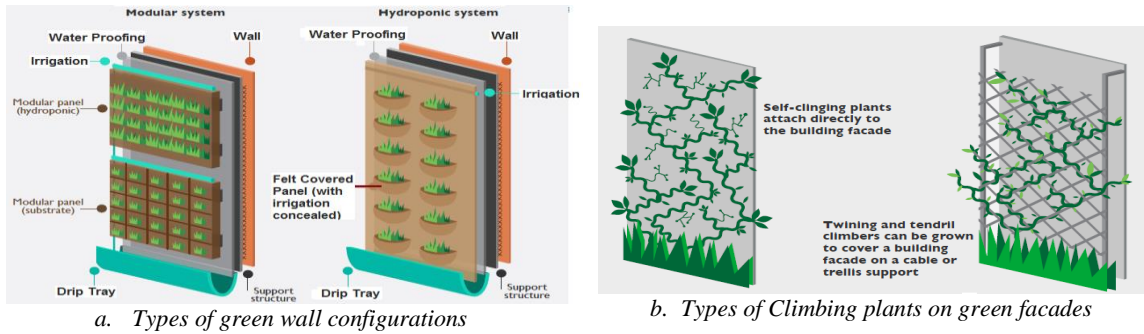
Typology of Green Wall and Green Facades Construction Schemes
